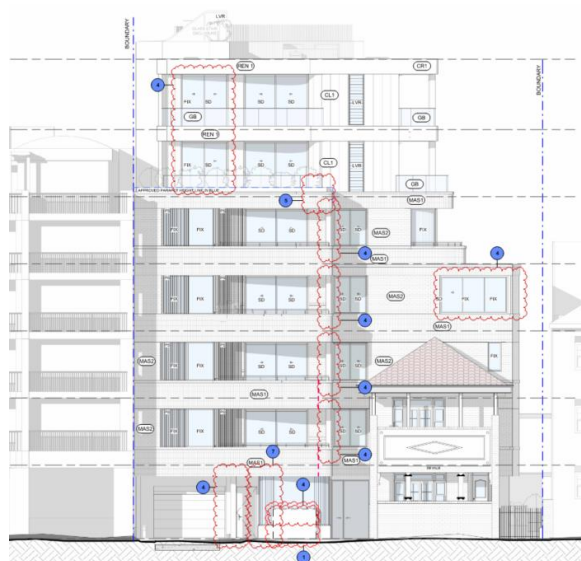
| The proposed development | Source: Platform Architects Pty Ltd
